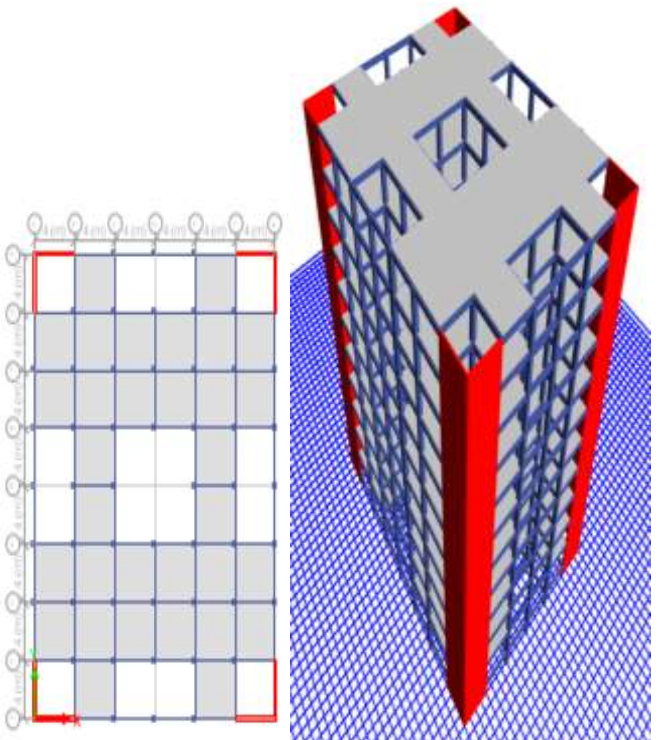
Plan elevation & 3D view for 33.32% slab opening with shear wall at corners.
